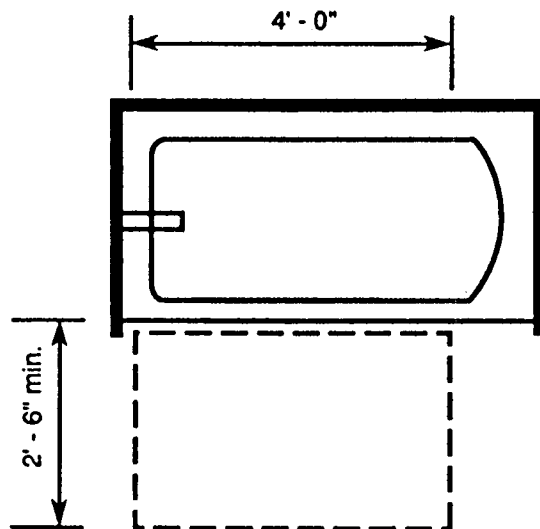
Alternative Specification – Clear Floor Space at Bathtub
